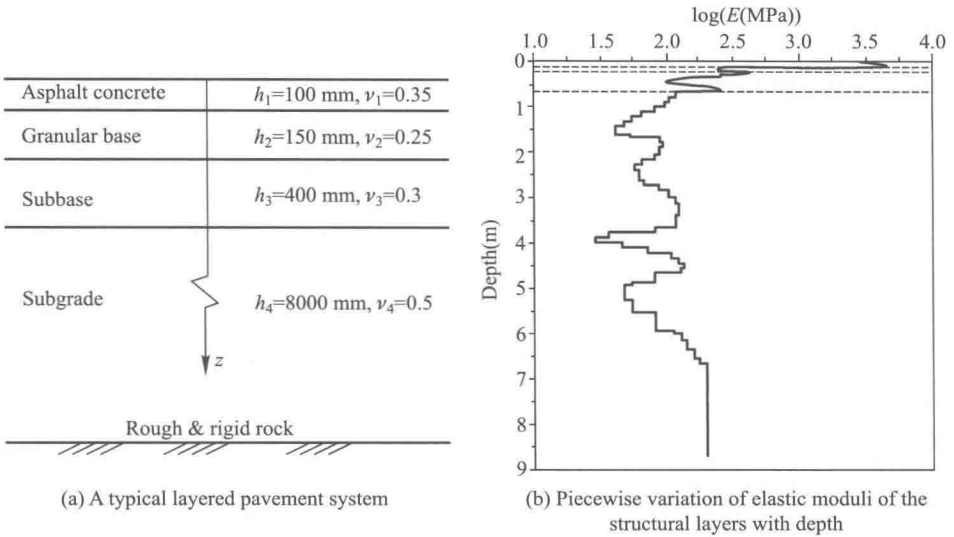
Structural layers of asphalt concrete pavement with variable elastic moduli in depth
